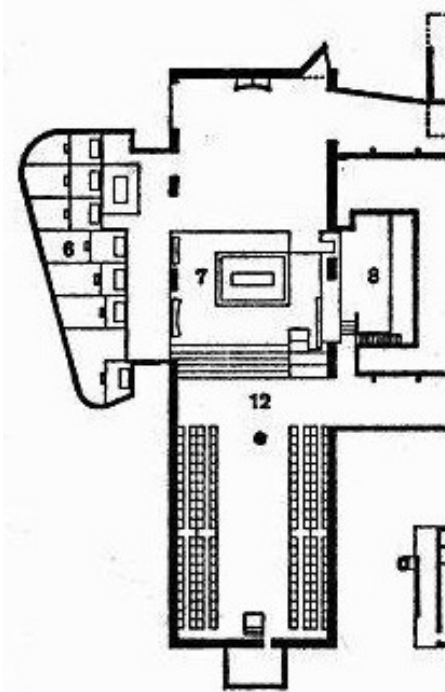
Floor plan of the priory church.¹⁴⁵
